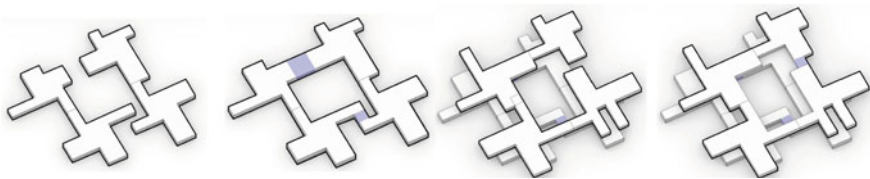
Staggered arrangement: criss-cross arrangement of blocks
